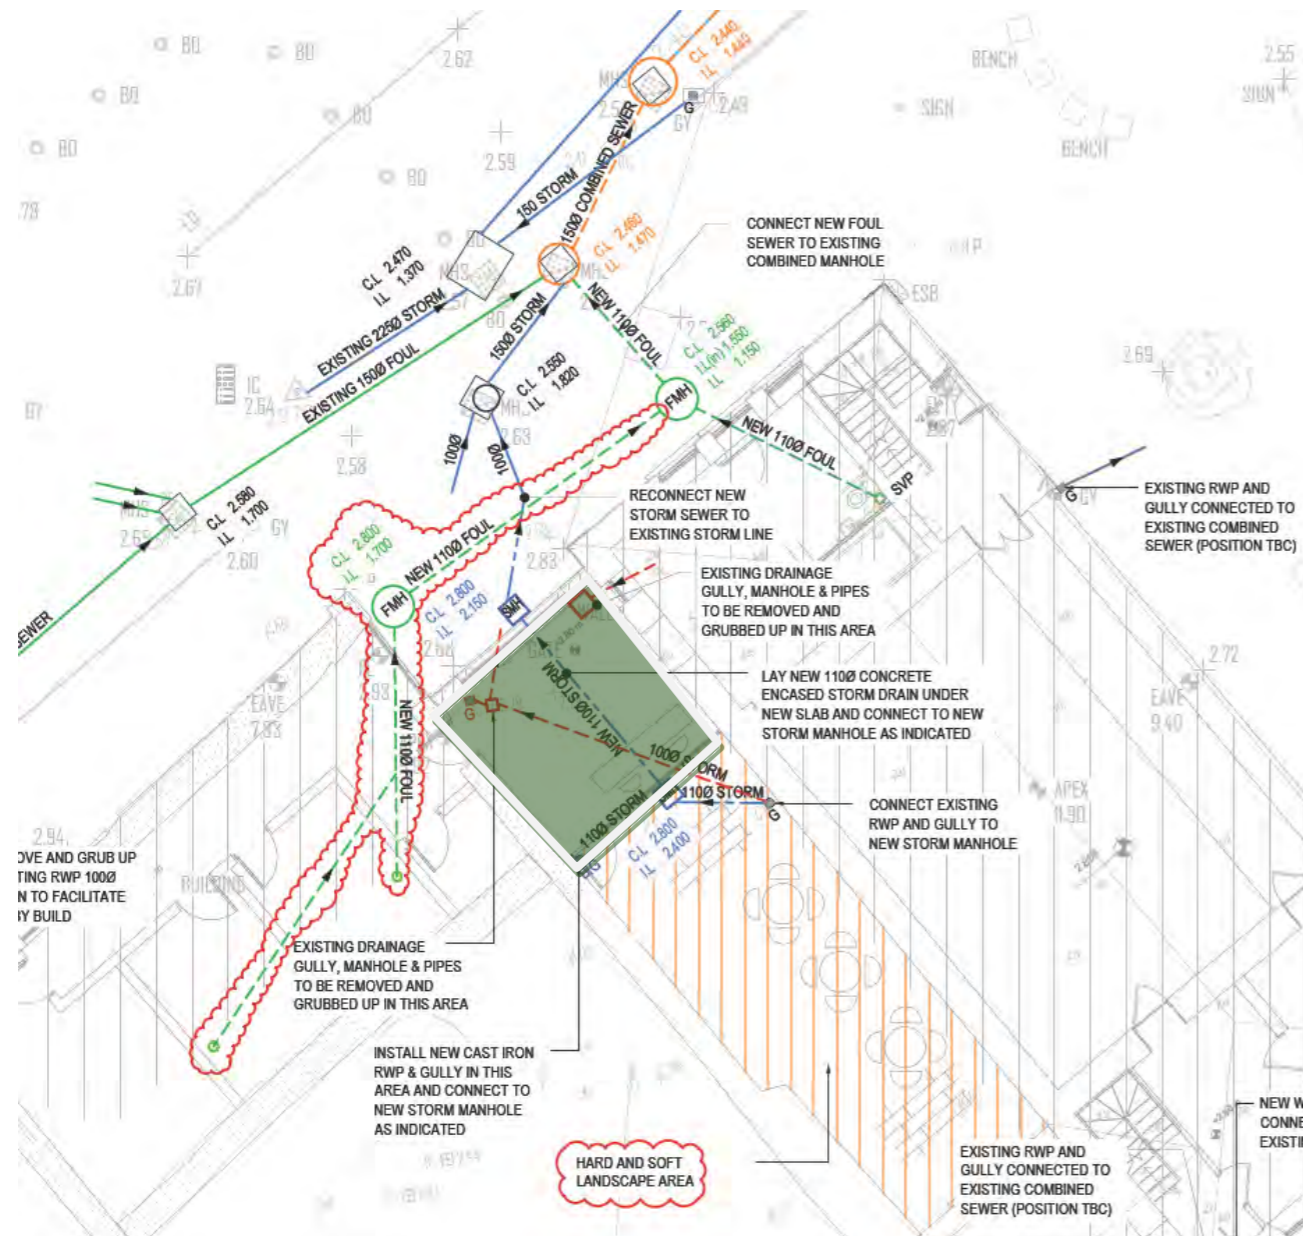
Proposed new manholes to the west side of the Courthouse building
